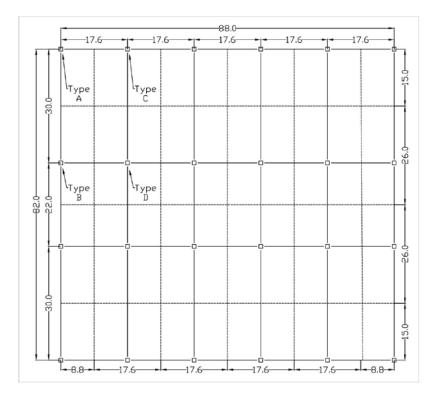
Tributary Area of Columns in Typical Floor Layout (ft)
